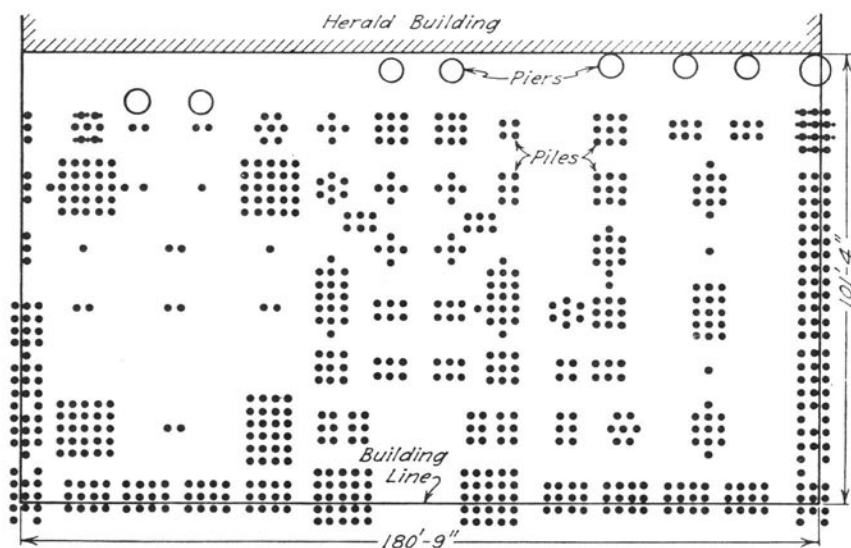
FOUNDATION PLAN OF STOCK EXCHANGE
